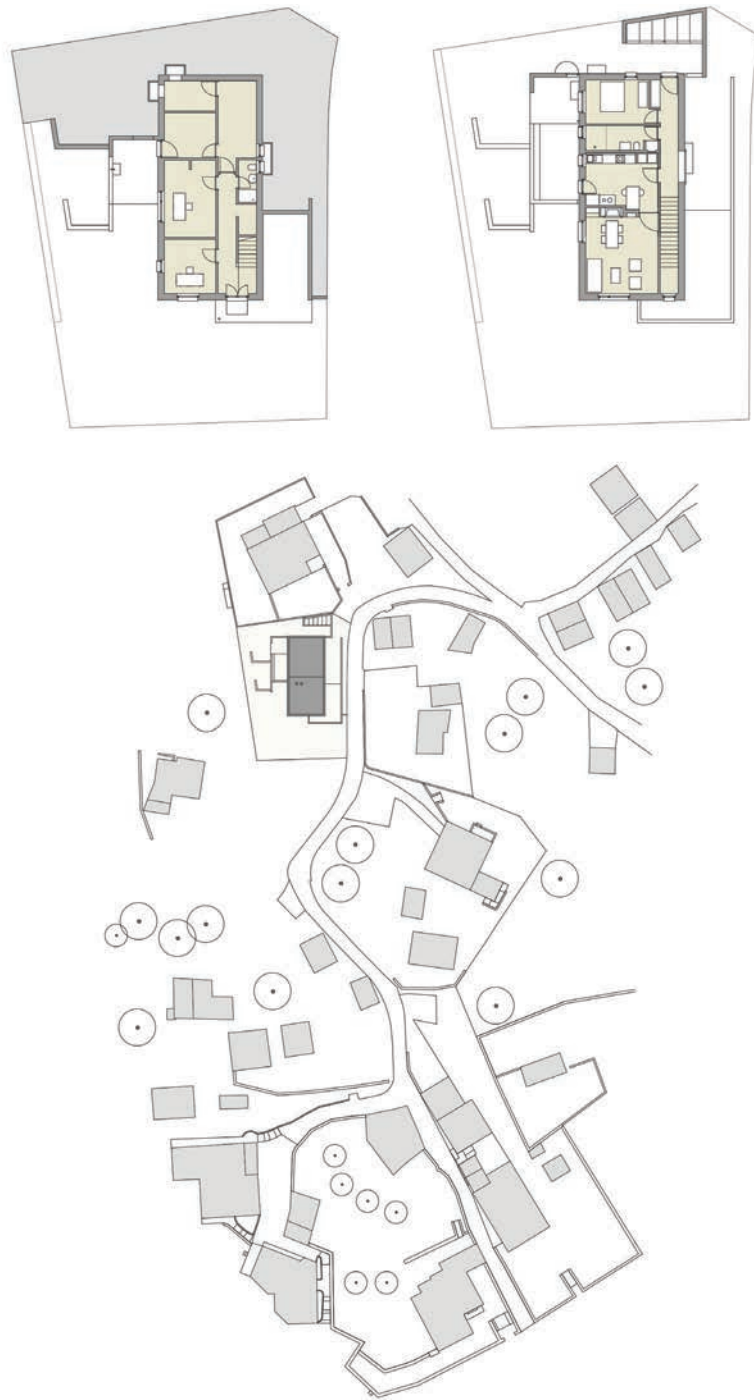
House in Castasegna, layout plans of the ground and first floor and planning framework
